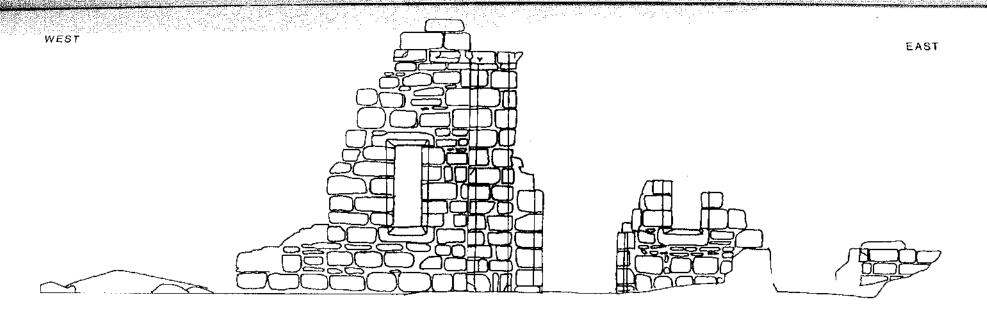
South West of Cloister. North Wall of Building. North and South Elevation. (Sterenberg et al.)
